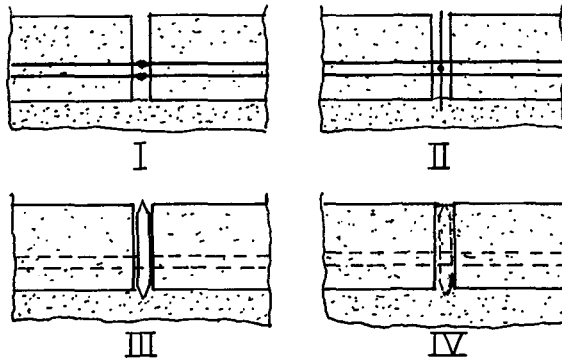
JOINT FOR PRESTRESSED SLABS USING HYDRAULIC COMPRESSION
